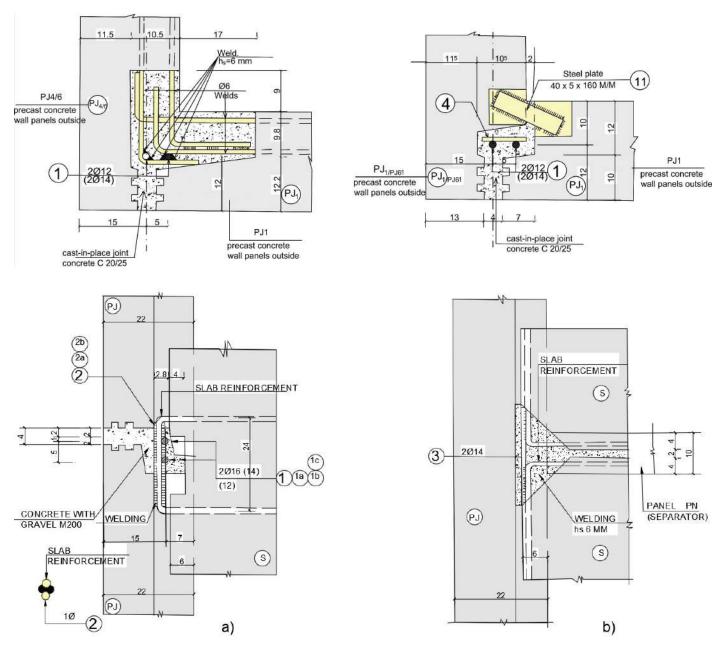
Horizontal joints between structural elements (source: AQTN)
